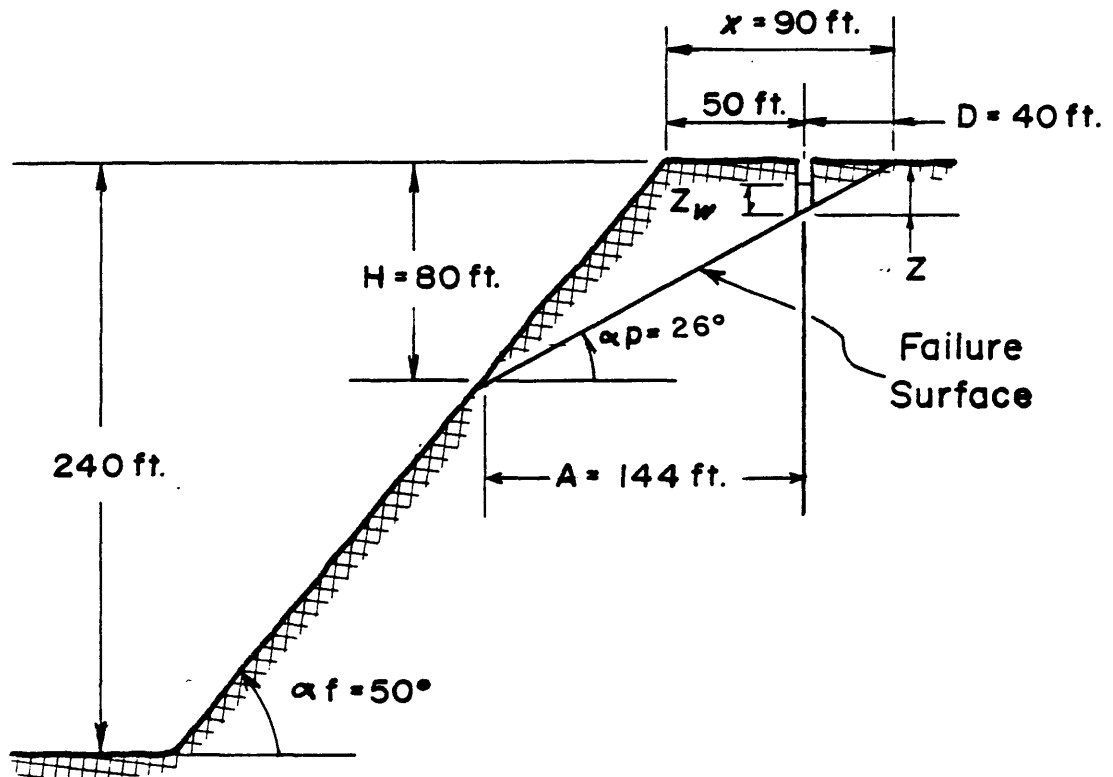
Geometry of possible slope failure in the south wall of the pit. (Modified from Hoek and Bary, 1977.)
